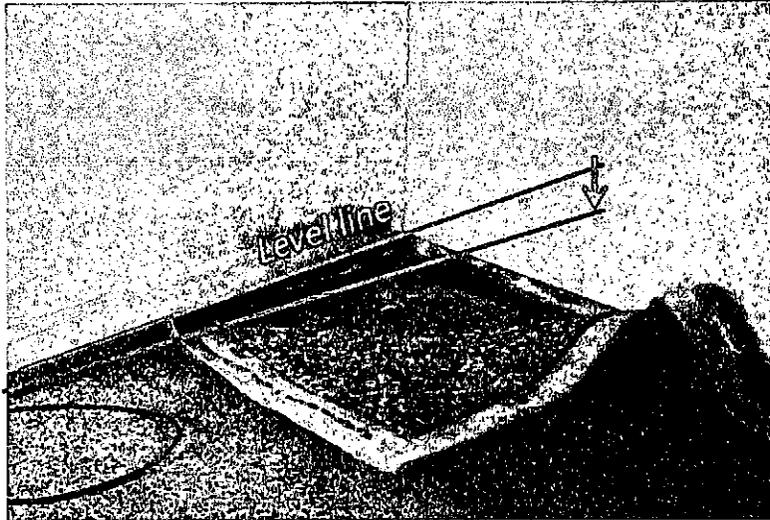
The interior floor slab is not supporting the exterior load-bearing walls, as seen here where the floor slab has settled independent of the walls.
